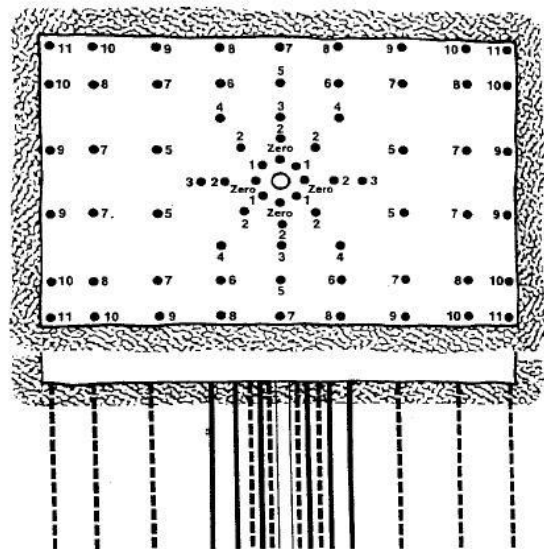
L. Typical pattern with large-diameter calyx drill hole offering relief.
